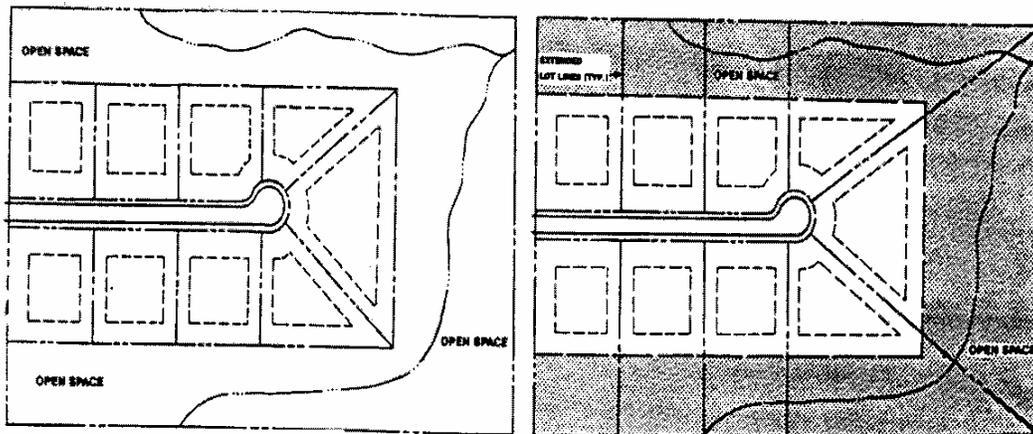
TYPICAL OPEN SPACE DESIGN (84 LOTS)
